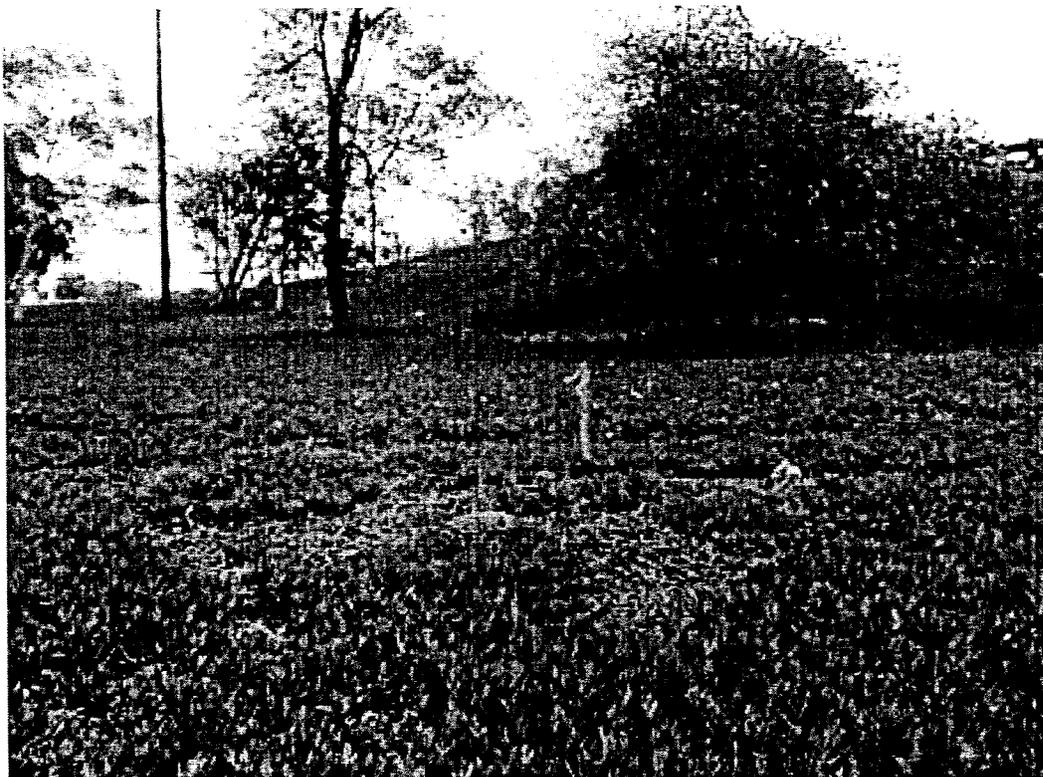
710/Florence Interchange, Section 710-3-b. Photo taken looking south.
